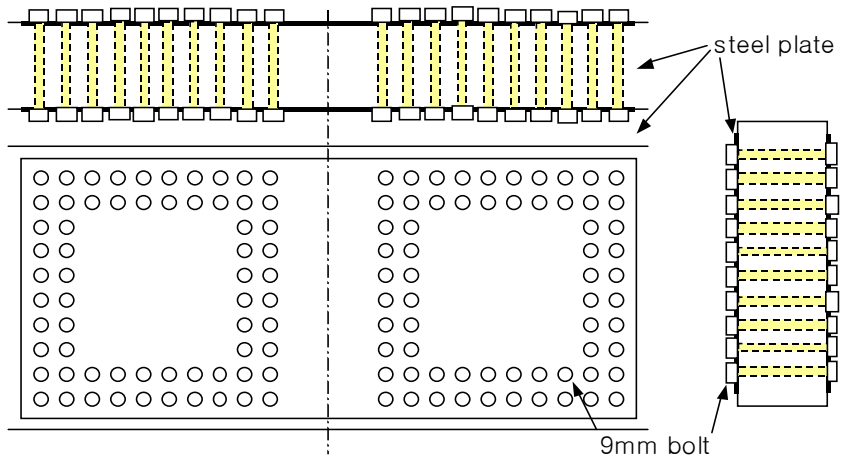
Bolted joint with whole steel plate(GP-type connector).
